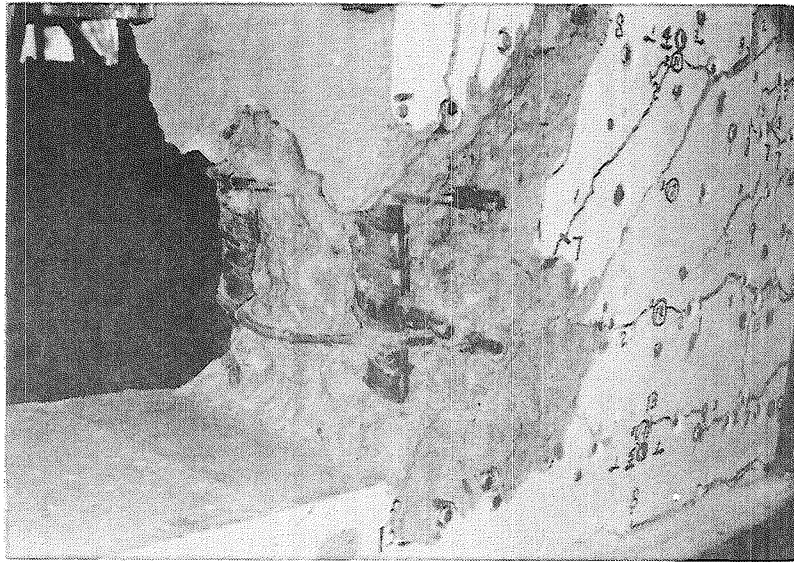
Critical Compression Zone of Beam N1-S32 at Failure
